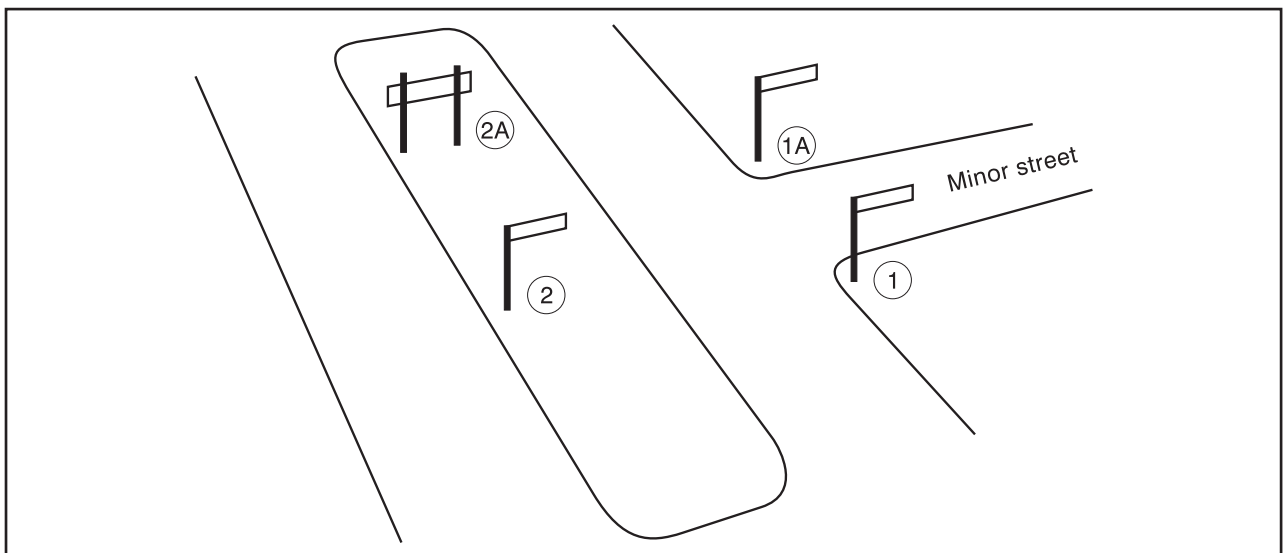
DIVIDED MAJOR STREET T-JUNCTION WITHOUT MEDIAN OPENING
